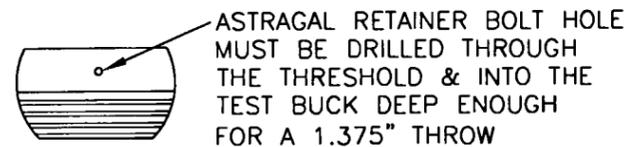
DETAIL "E" WINDJAMBER ASTRAGAL ATTACH ASTRAGAL RETAINER BOLT STRIKE PLATE TO FRAME AS SHOWN.
